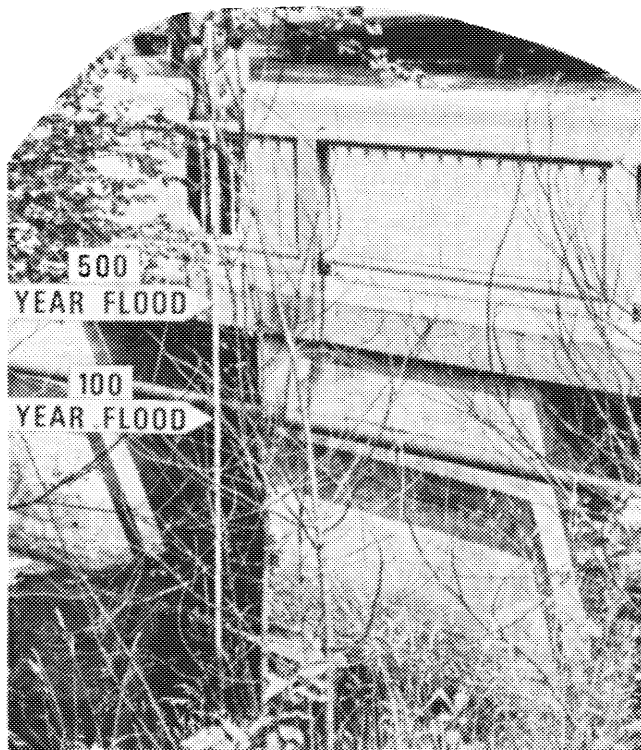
Queset Brook, Station 44+00. Future flood heights at Washington Street (Rte. 138).
